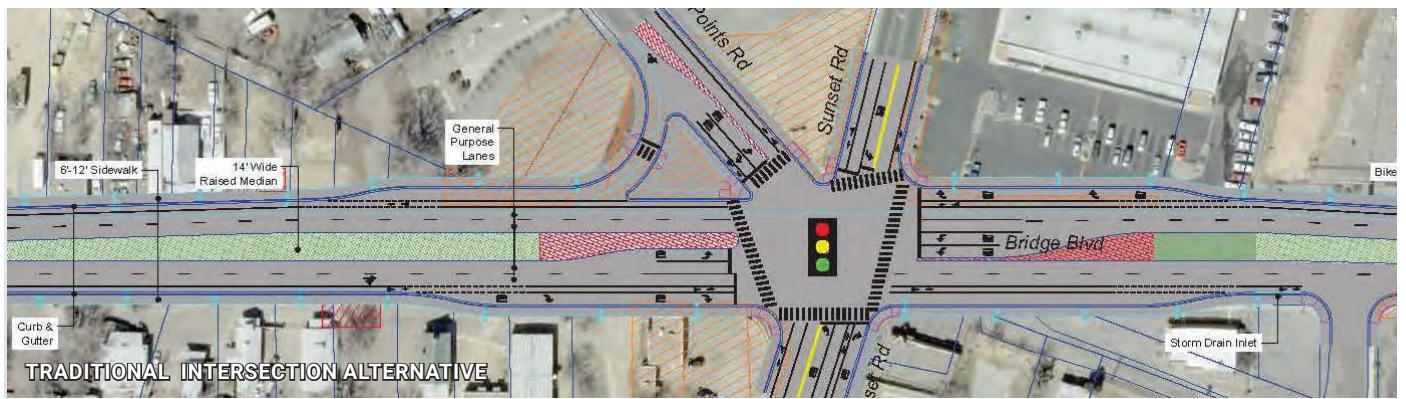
Proposed Bridge Boulevard Roadway Improvements
